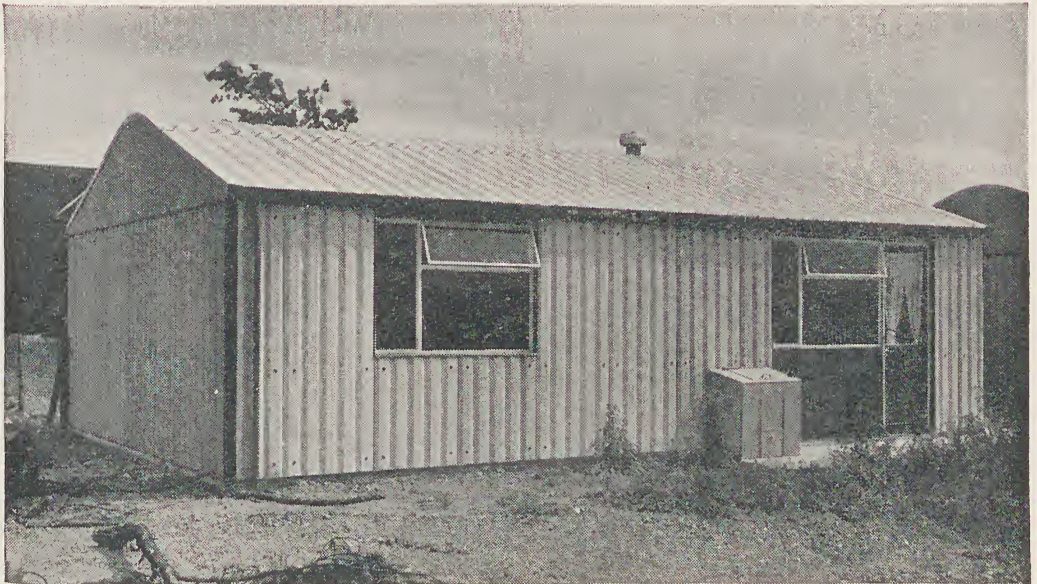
“ Arcon ” house with walls and roof of asbestos-cement.
